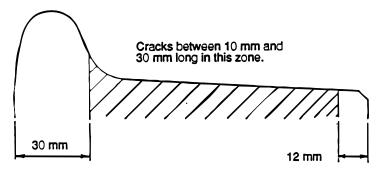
Class 2 rolling contact fatigue crack zone
